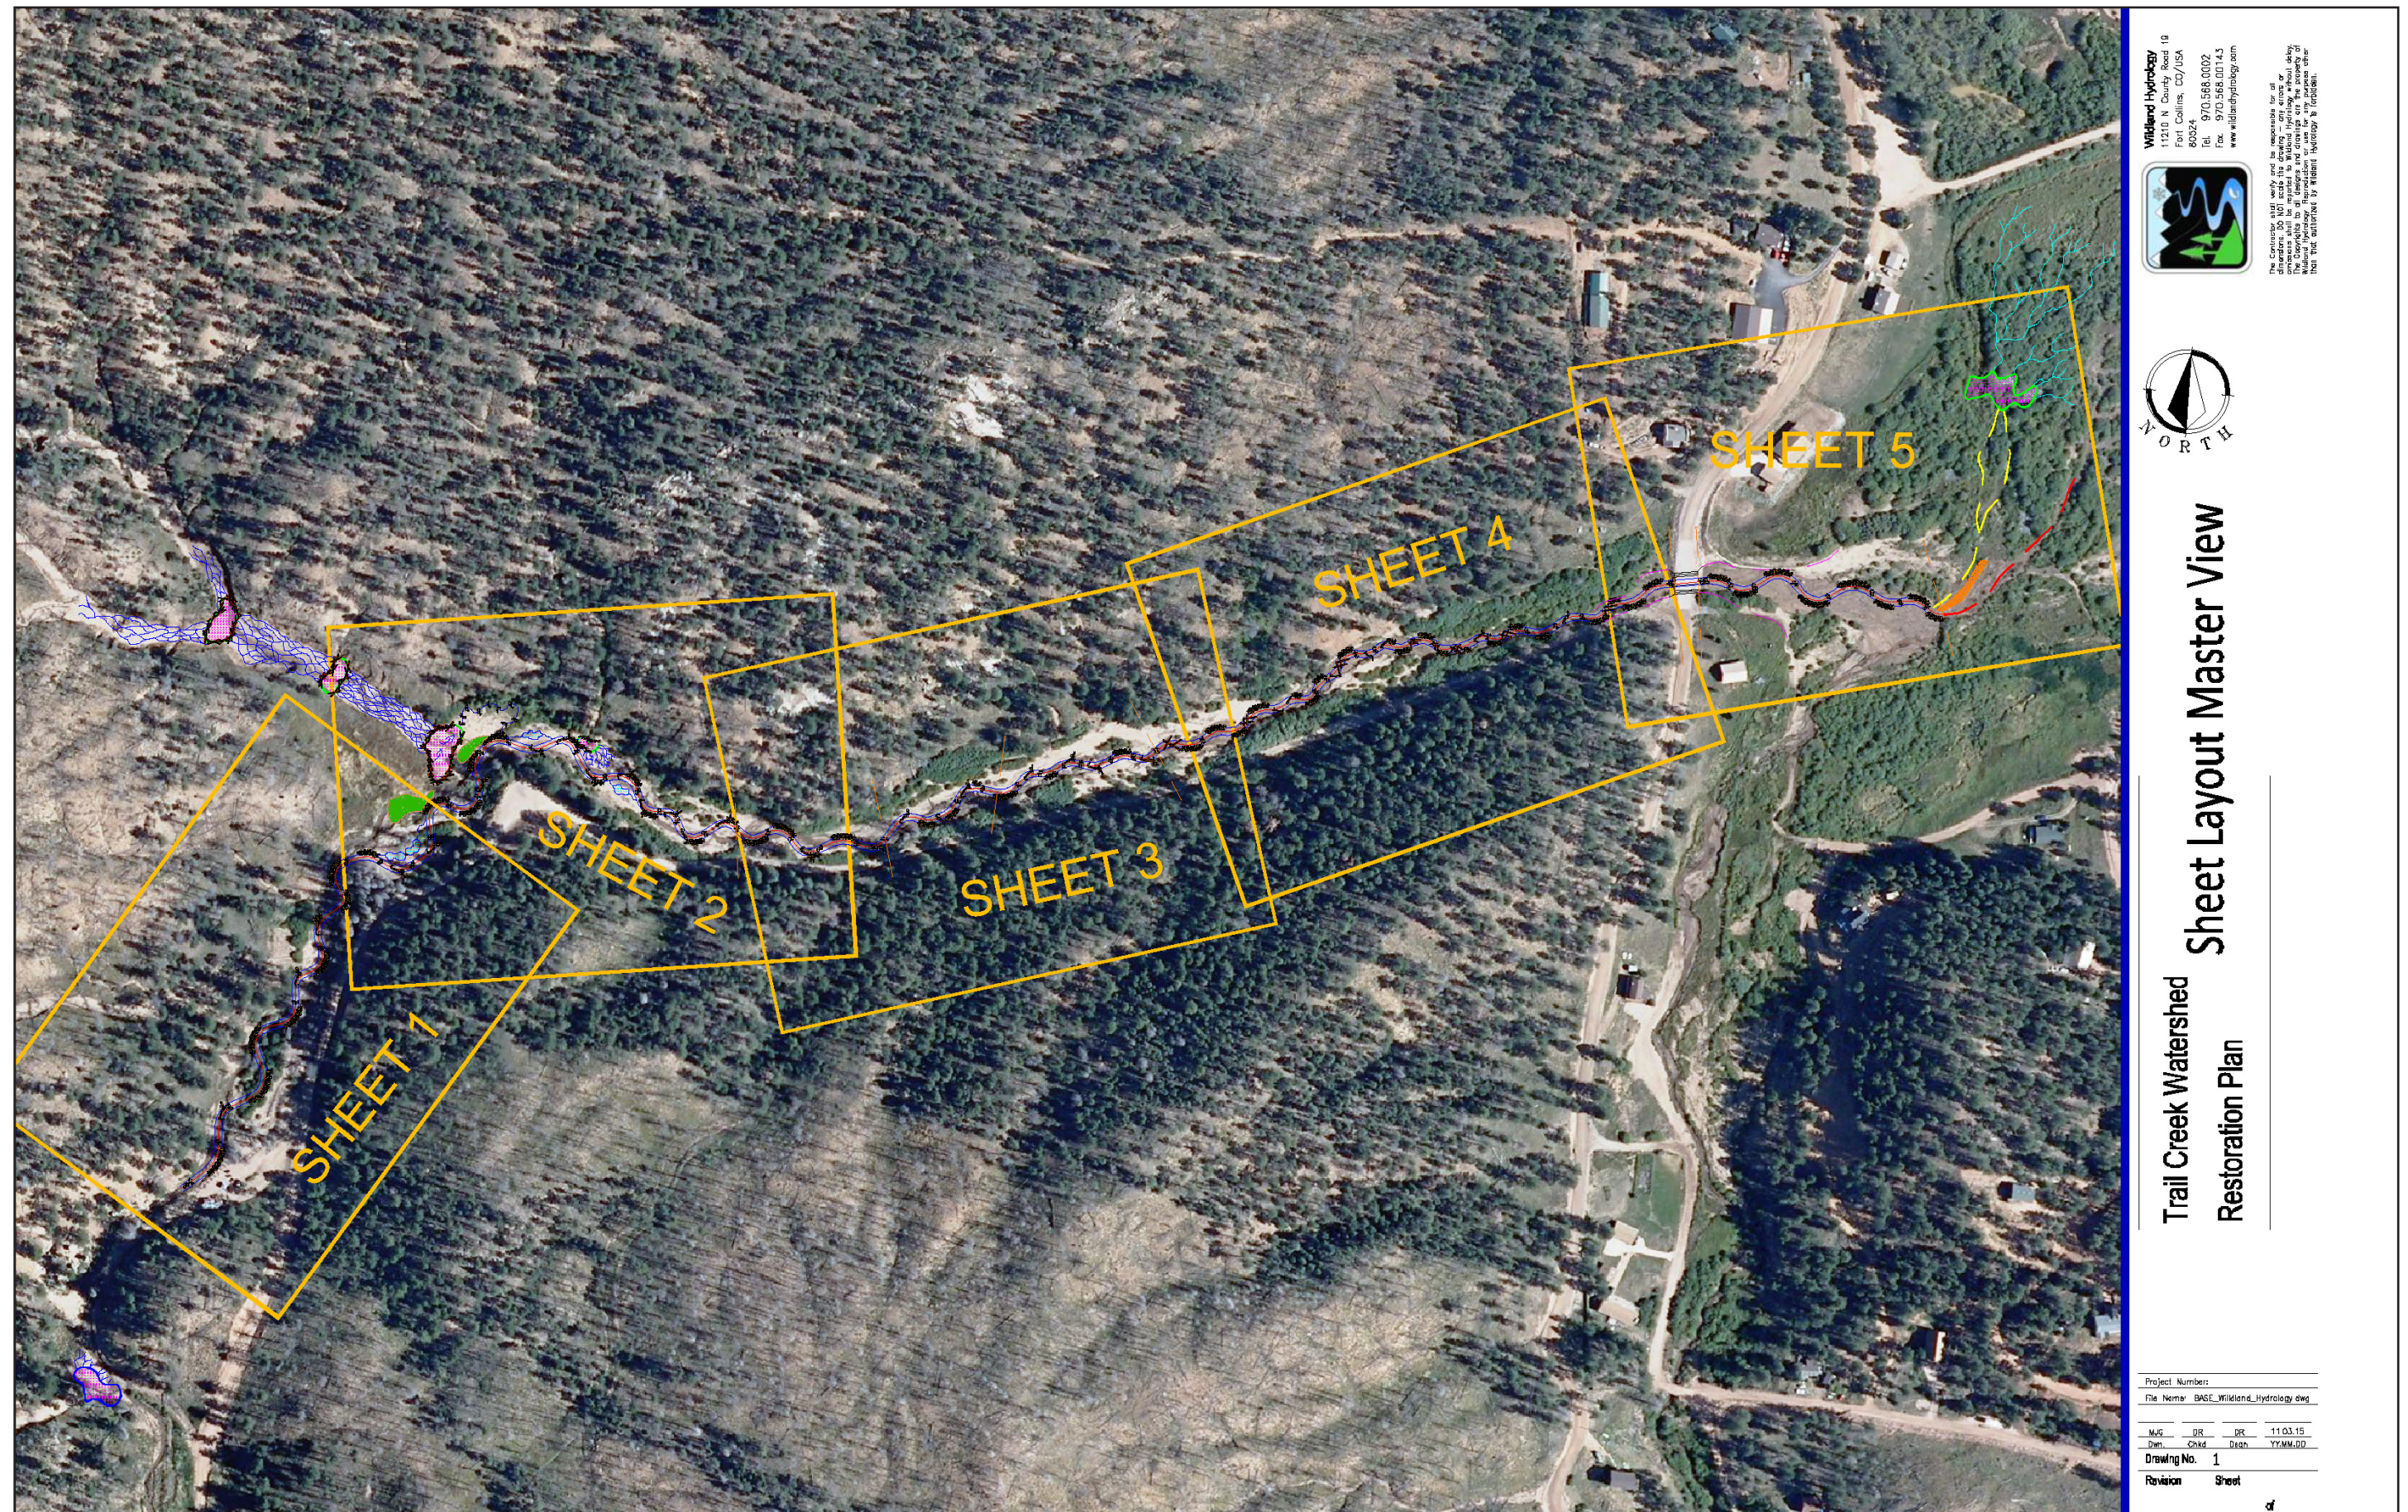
The master layout view of the sheets corresponding to Figures 41–45 that depict the general restoration design plan for lower Trail Creek.
